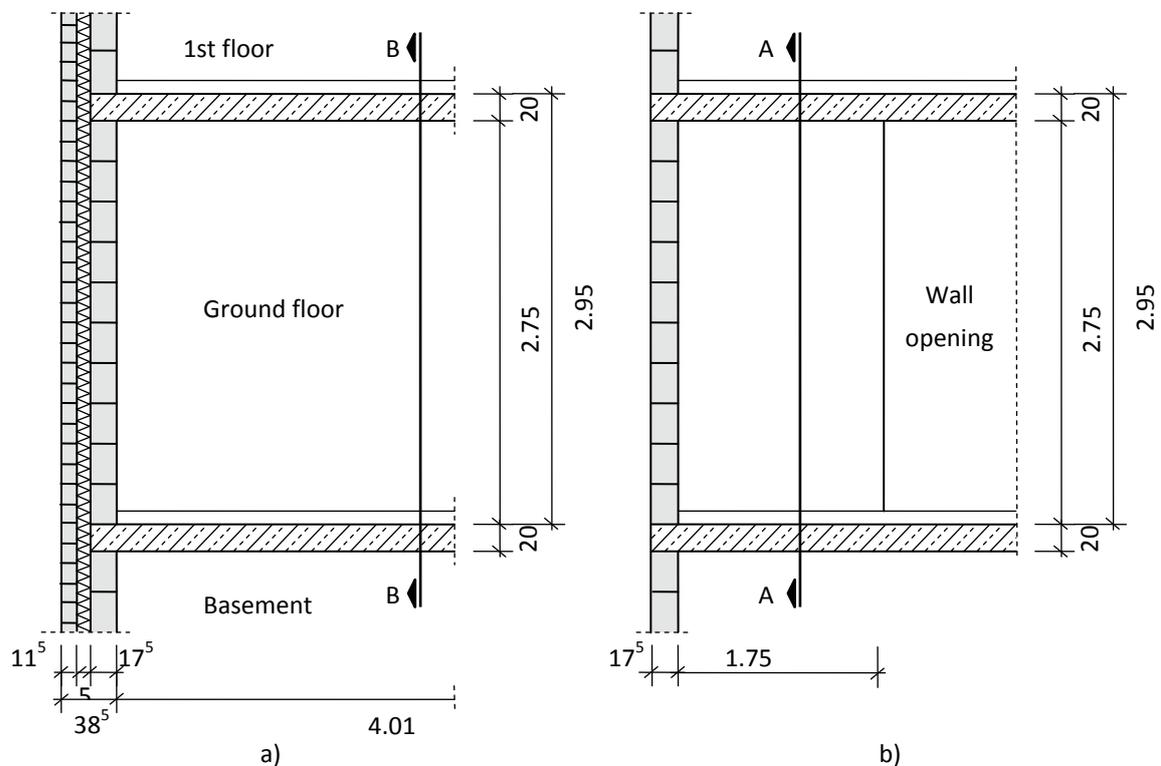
Bracing wall plate, a) vertical section through the bracing wall (section A-A), b) View of the bracing wall from the interior (section B-B)
